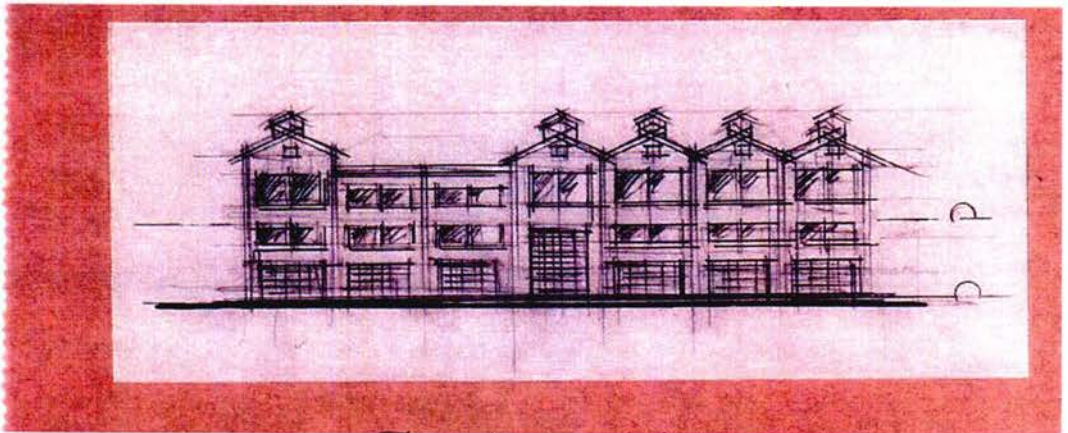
Front elevation sketch of proposed new 12-unit artist live-in studio development on Dockland site, City of Victoria
